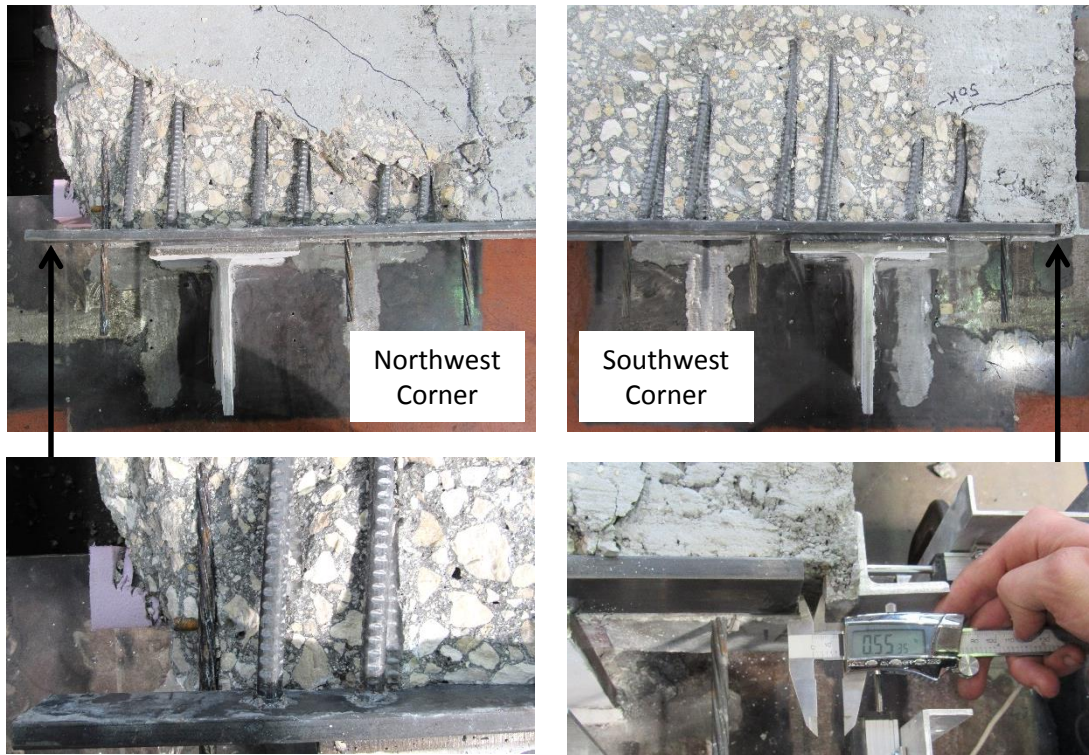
Concrete Side Face Breakout Failure for PCP Detail A.1.MAX
